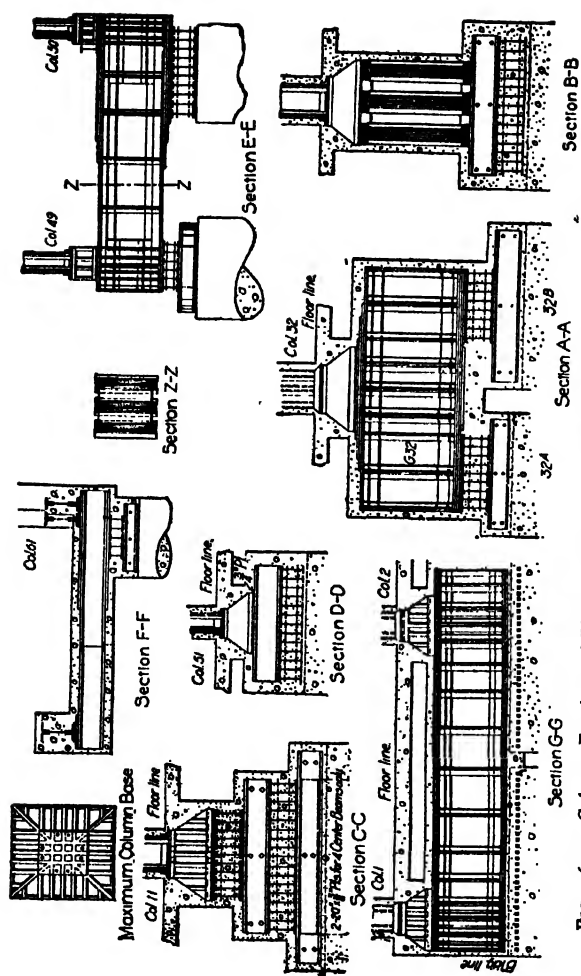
Column Footings of Plate Girders and Grillages, Woolworth Building, New York City.
